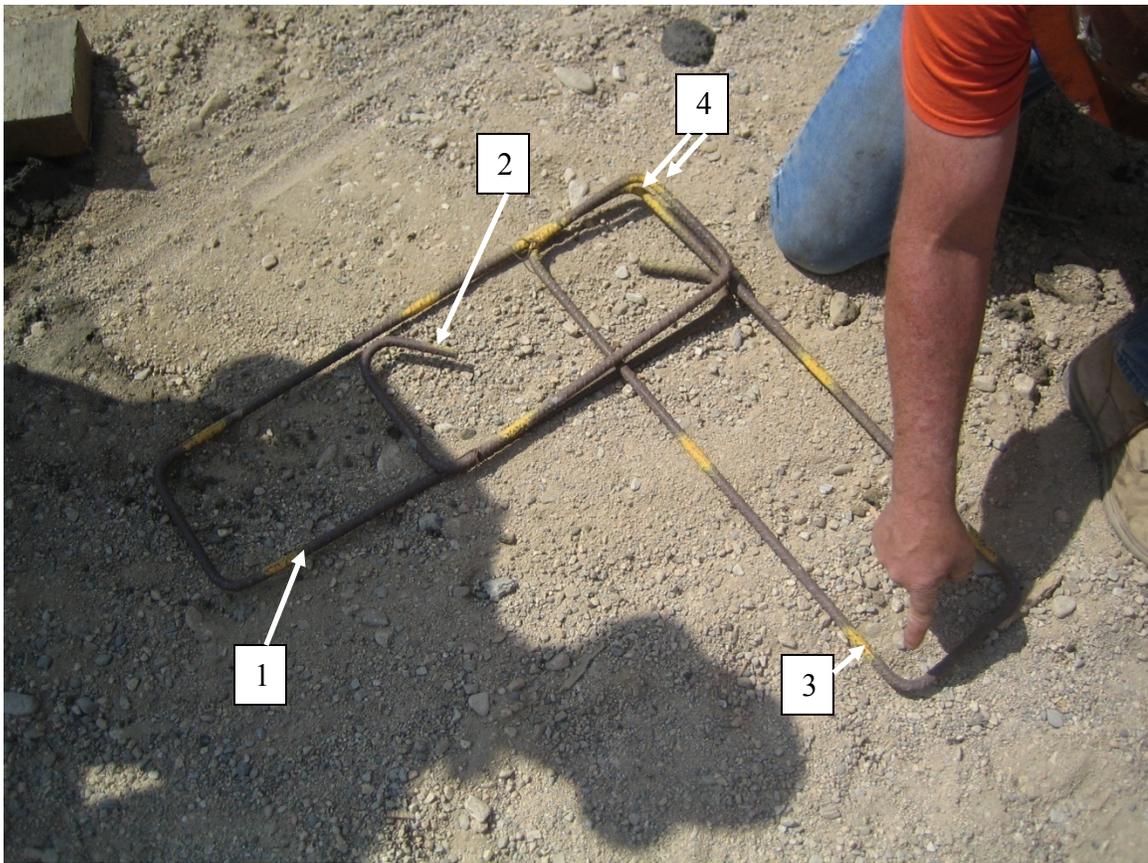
Uni-tie used to reinforce wall corners on the USC site (photograph taken by Kristen Parrish, 7/9/07)
